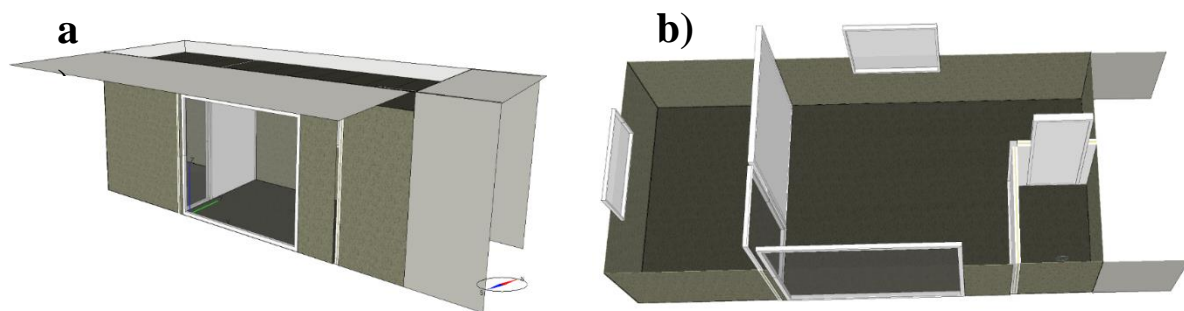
Building model from IDA ICE. a) envelope with shading surfaces b) interior walls and openings.
